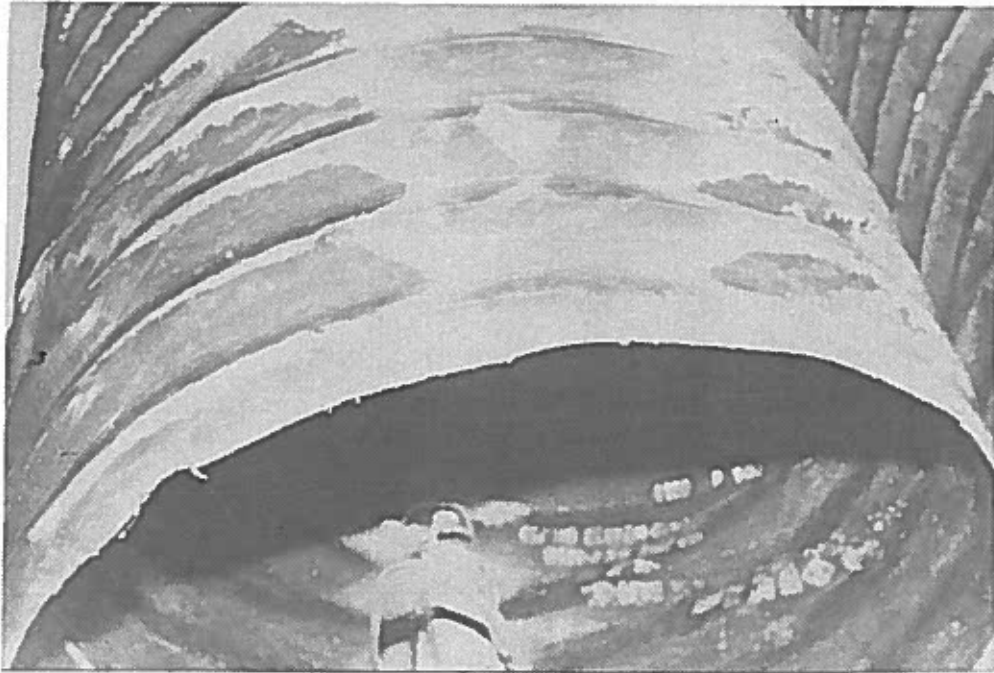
A close-up of the outside of this culvert suggests a small amount of damage to the coating.
